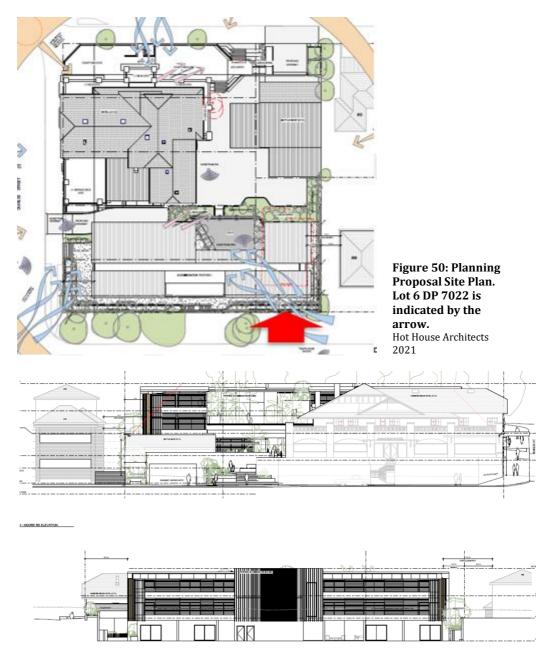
Planning Proposal North and South elevations. Hot House Architects 2021
